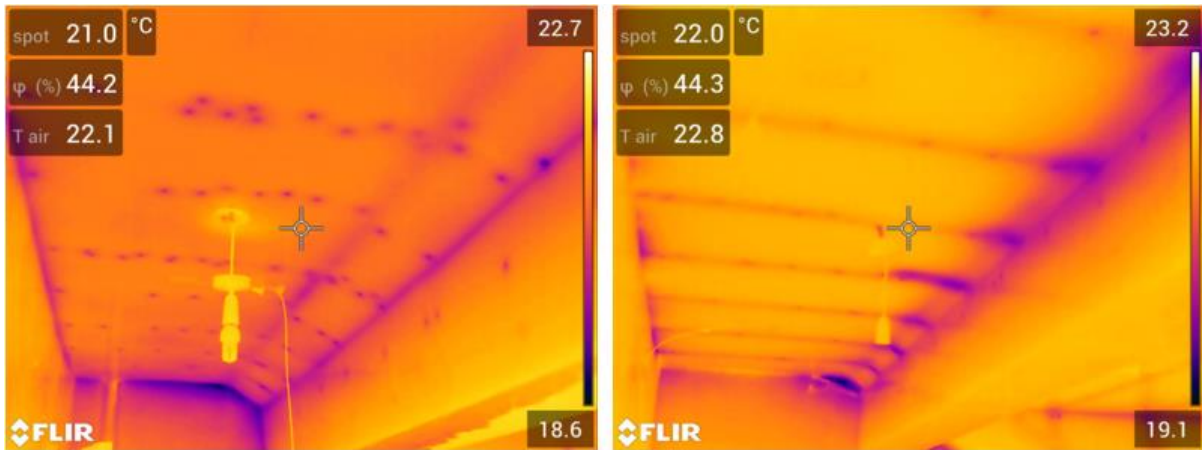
Thermograms showing roof below ridge and upper dormer beam for; TIWI over-boarded RiR (left) and conventionally retrofitted RiR (right)
